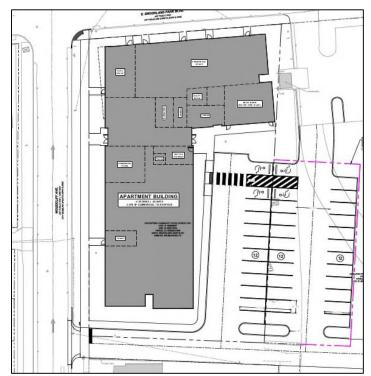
Site Plan, 1203 East Brookland Park Blvd
